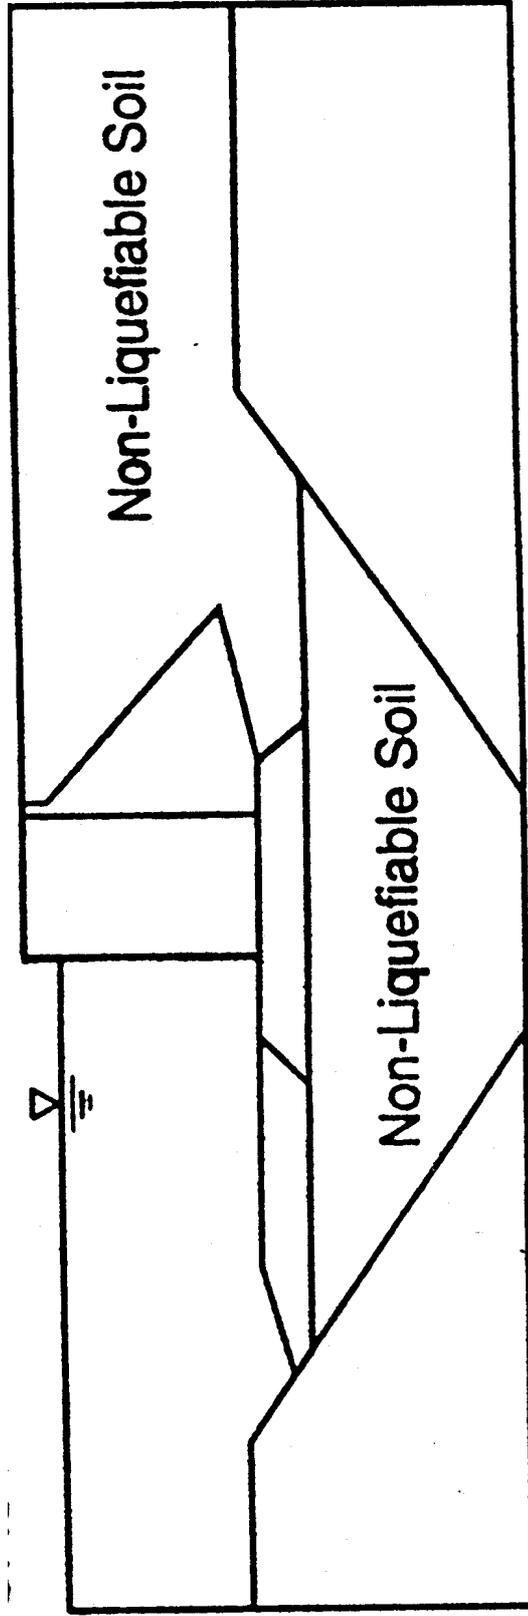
Simplified Geotechnical Conditions For a Gravity Quay Wall (PIANC,2001)
